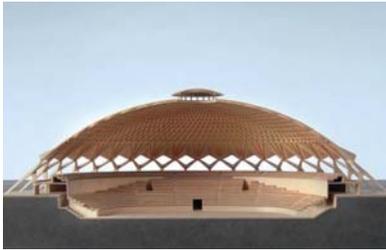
Nervi: Sport building, Rome (www.pinterest.com)
